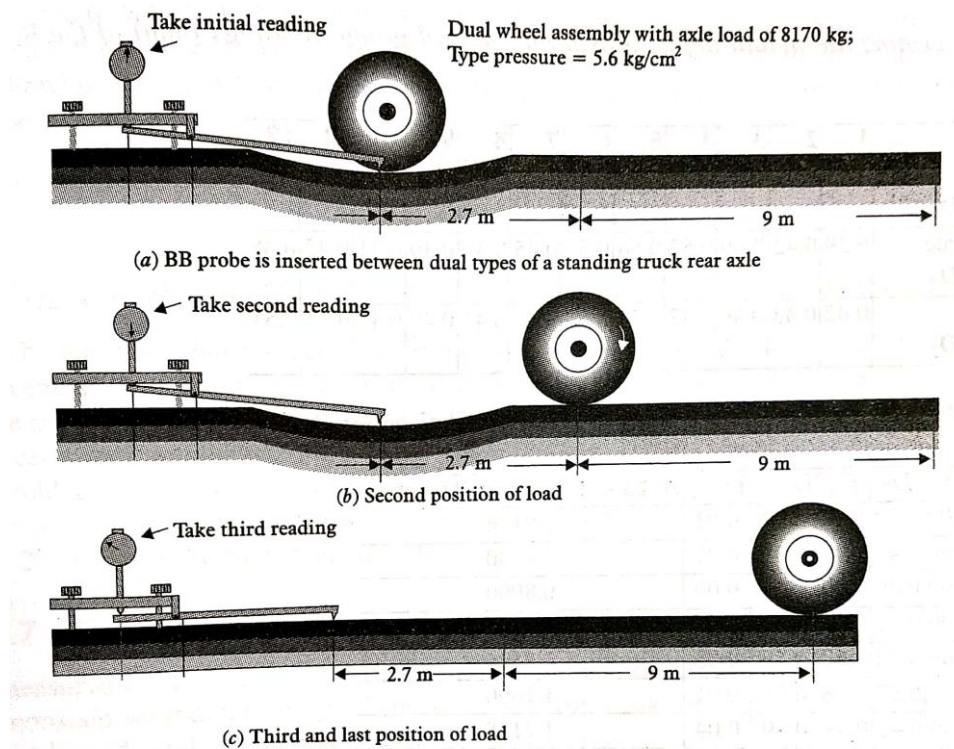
Measurement of pavement surface rebound deflection using Benkelman Beam
